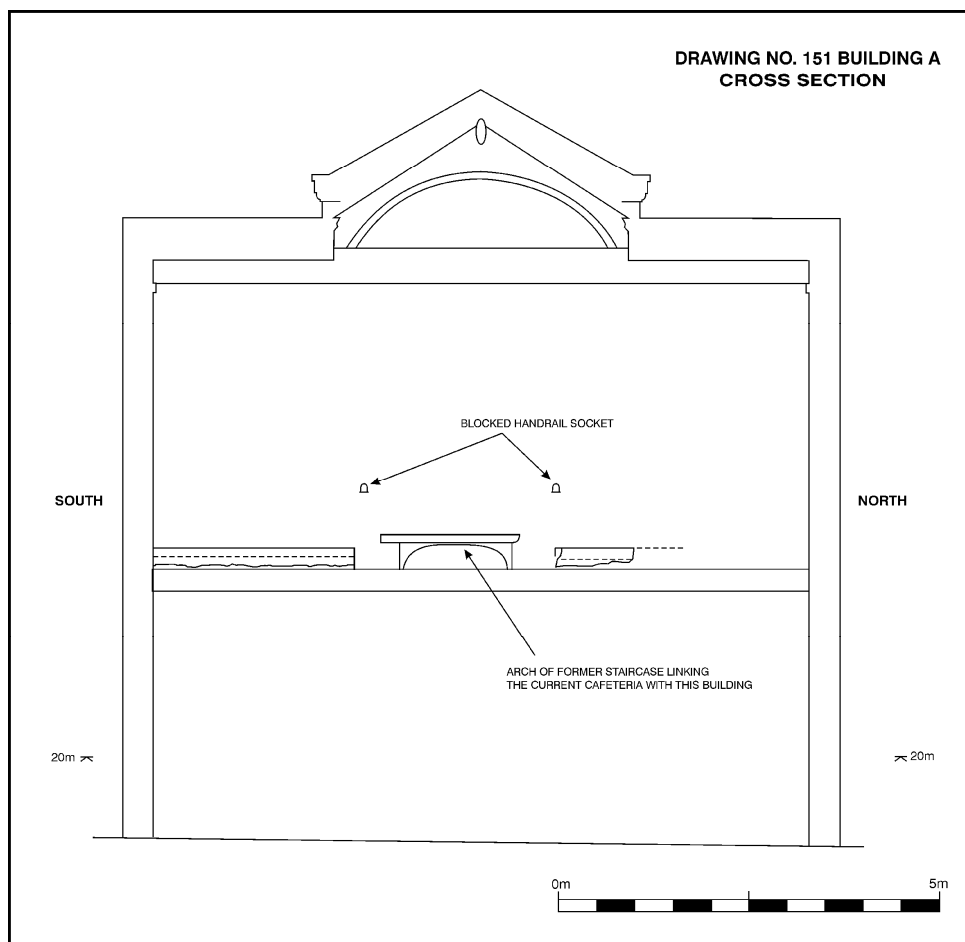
Cross-section of the western end of Building A (scale 1:100)
